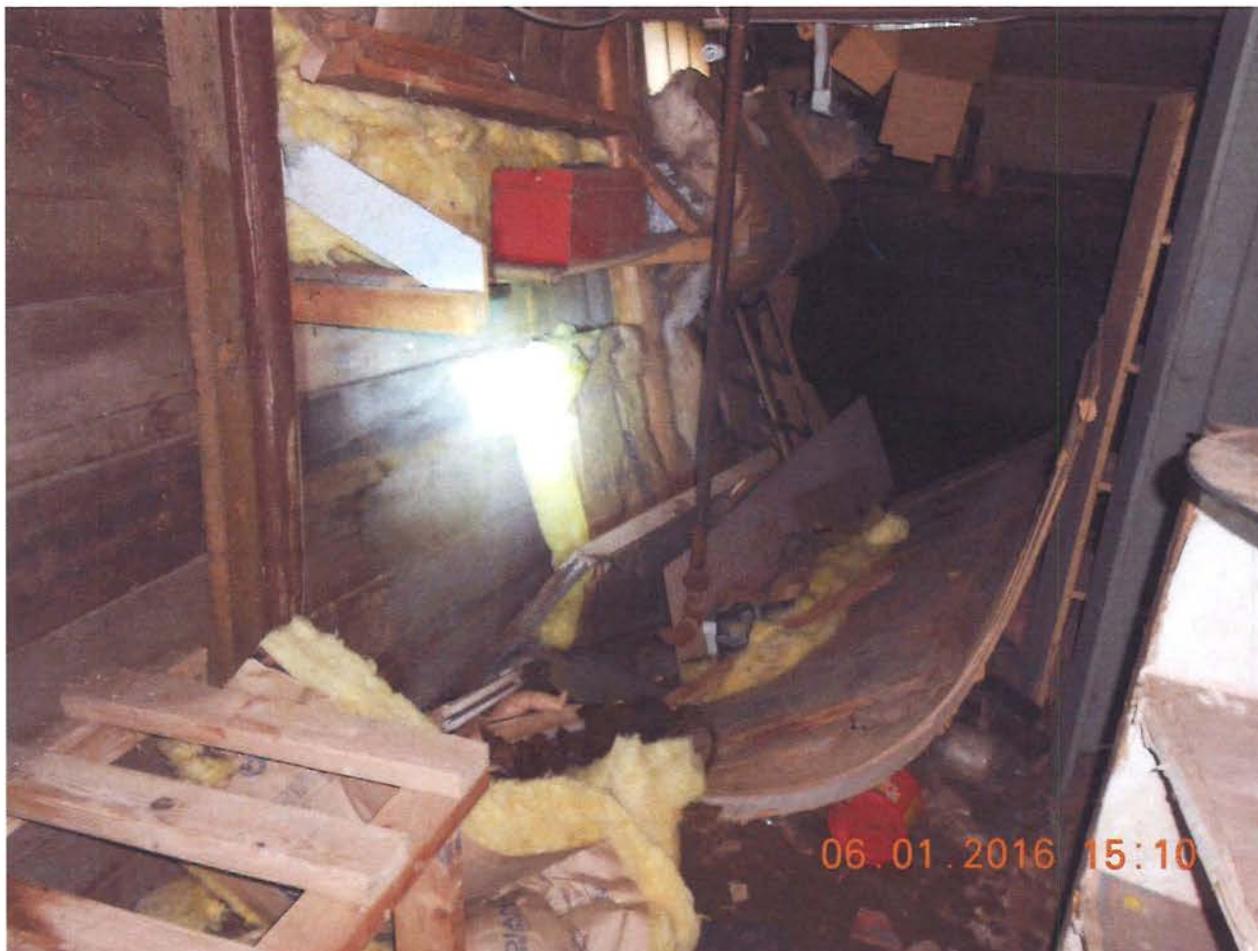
shows the deformation of the wall due to structural failure, rot and instability.
